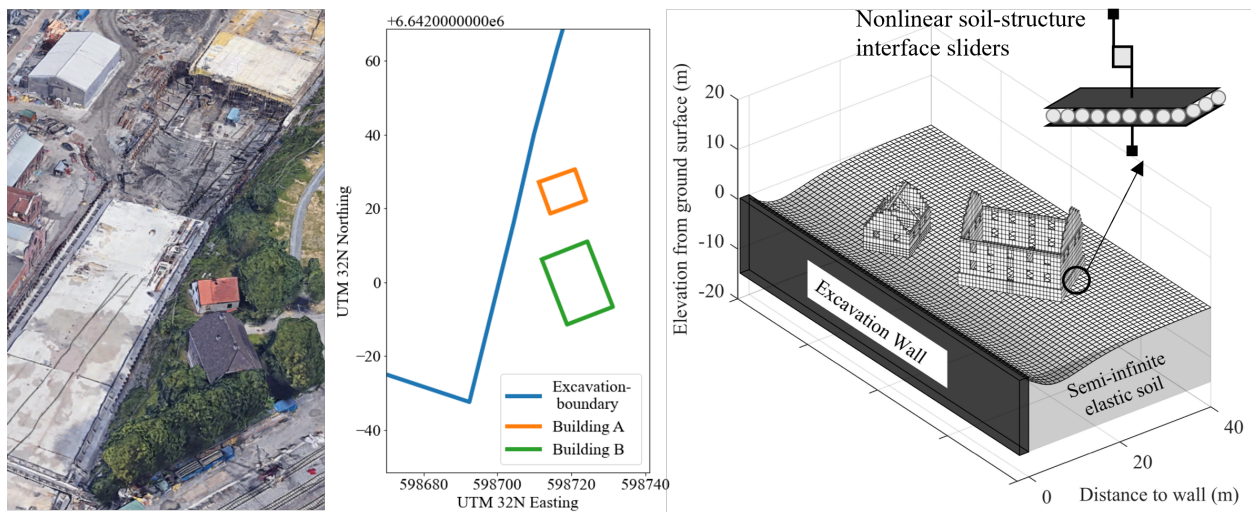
Numerical experiment problem: (a) bird’s eye view of the studied area; (b) location of the excavation wall and studied buildings; (c) ASRE3D model
